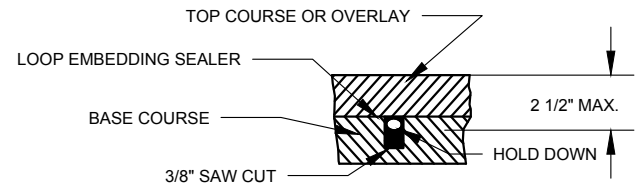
DETAIL "C" SIDE VIEW - LOOP LEAD IN AT PAVEMENT EDGE
